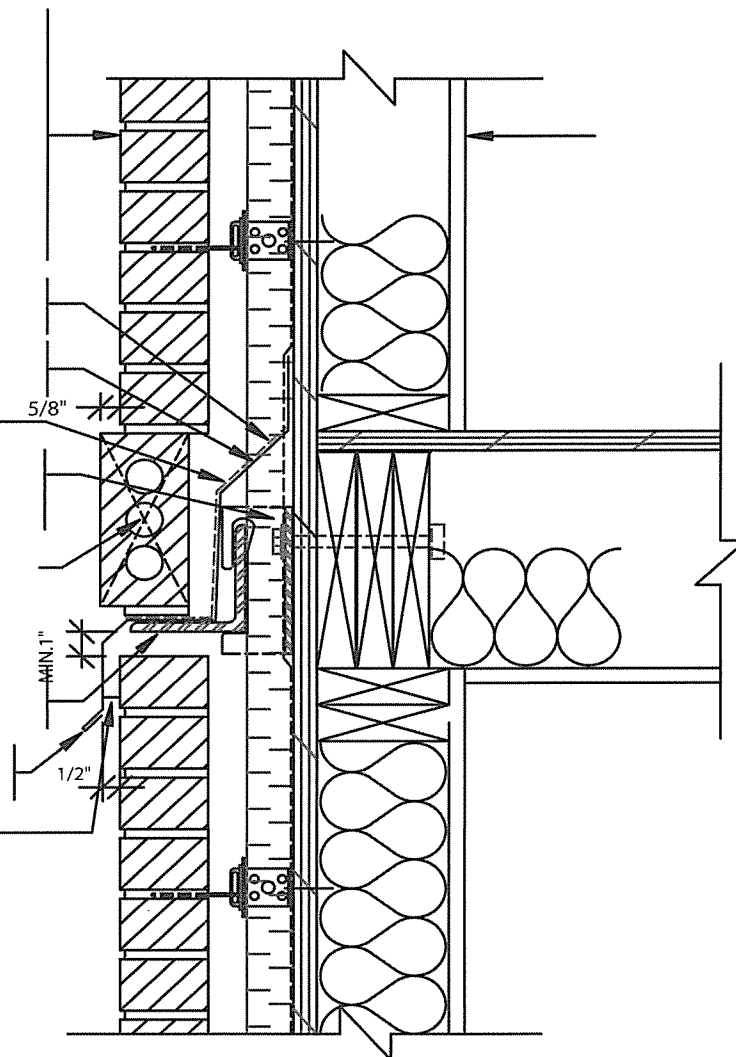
Use of FAST System to Provide support to Masonry Veneer
